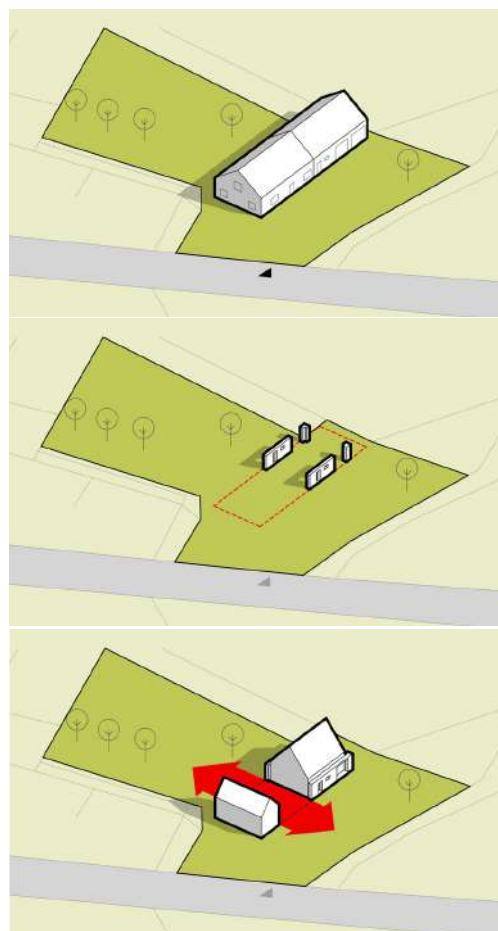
The house in Stará Červená Voda stands on the ground plan of the original house. However, the orientation and connections to the public space have completely changed. (Source: TŘI.ČTRNÁCT architects)
